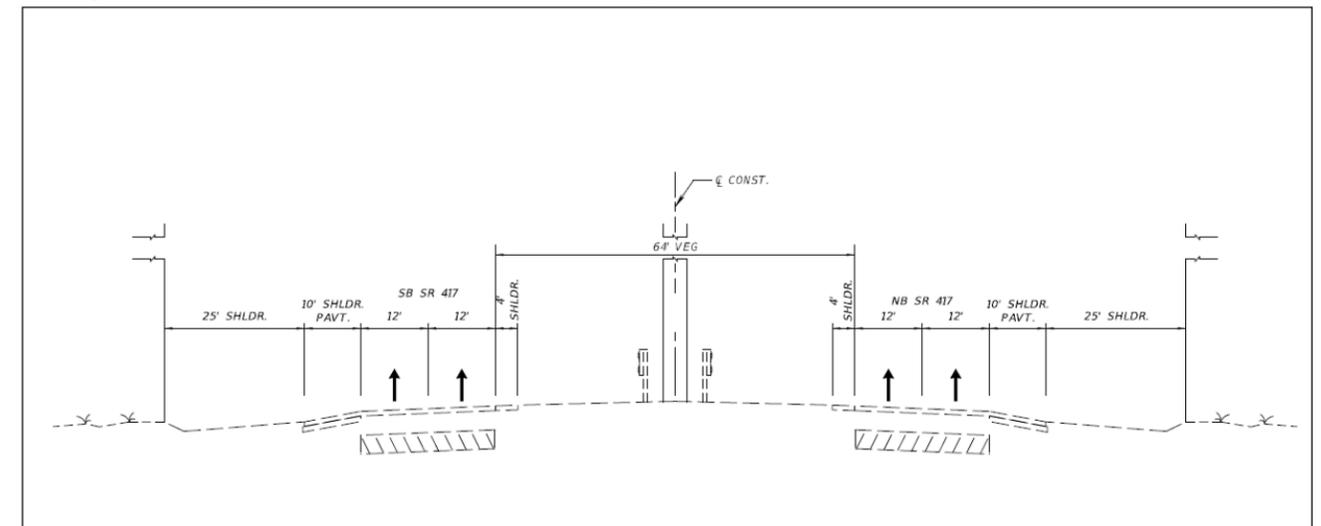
Typical Section at SR 417 Underpass at Lake Nona Boulevard (Structure # 755818)
